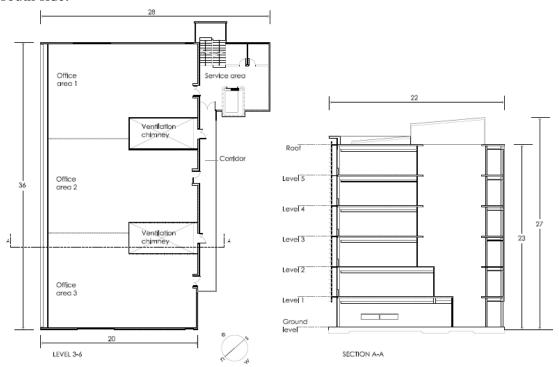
Plan used for energy calculations, and cross-section through the ventilation chimneys.
